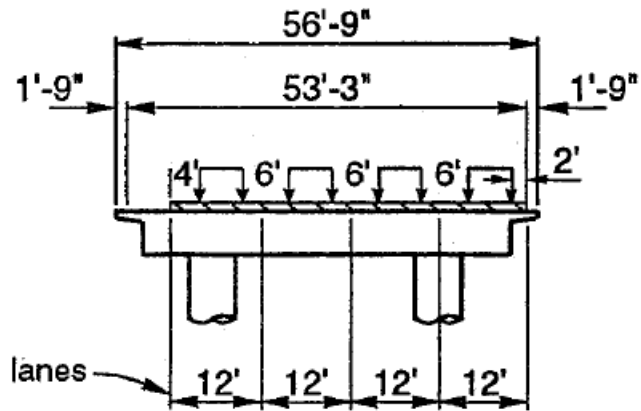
Wheel Line Spacing for Four HL-93 Trucks
